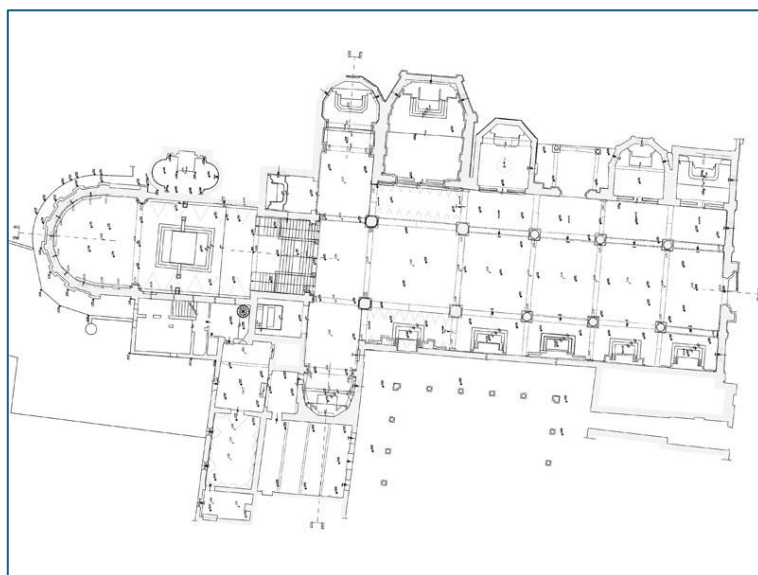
Vicenza, Basilica of Santa Corona, plan of the church showing bay articulation. (Source: [SM Ingegneria](#))
